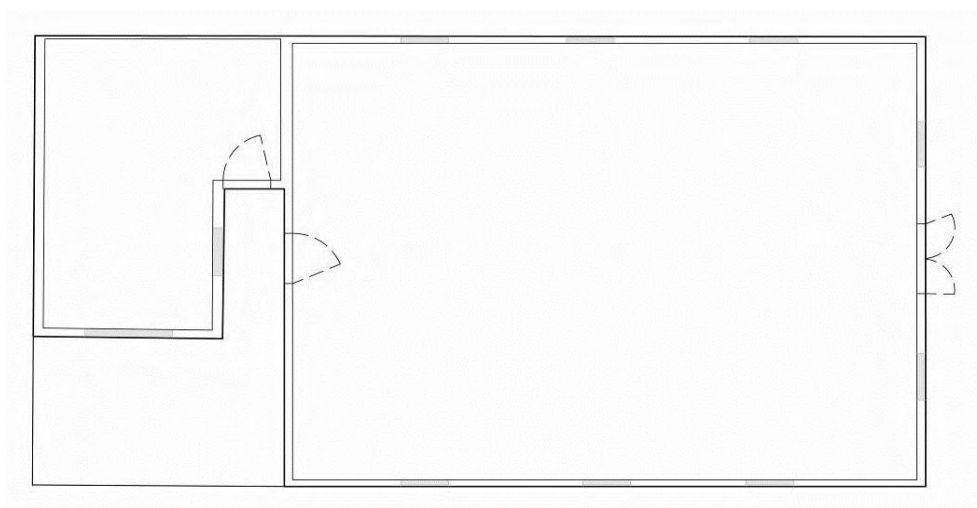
Floor Plan showing the internal layout of the Church Hall (not to scale). (Source: Craig & Rhodes, 2010).
